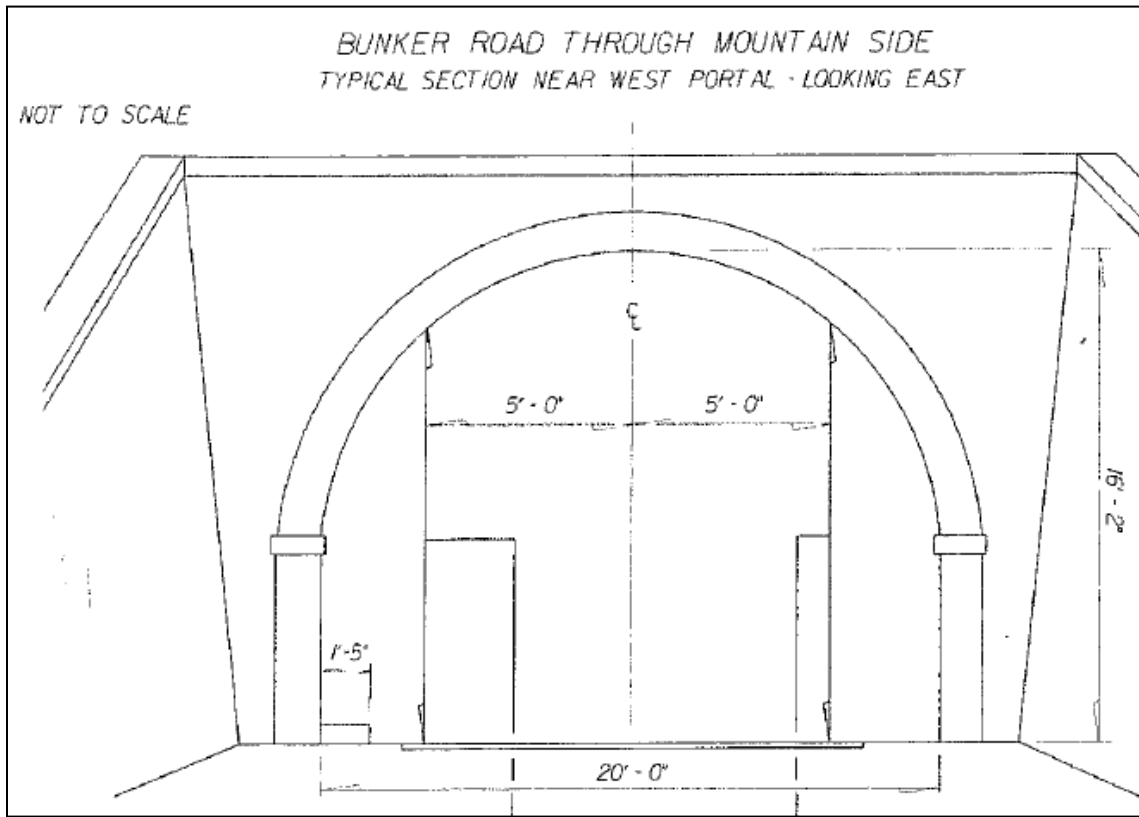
Tunnel cross-section (Image credit: FLH)
